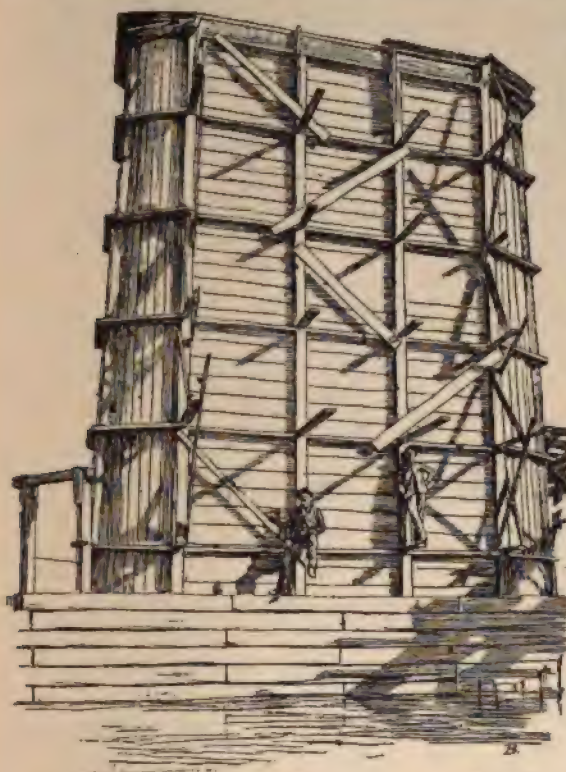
CONCRETE FORMS. RED RIVER BRIDGE.
